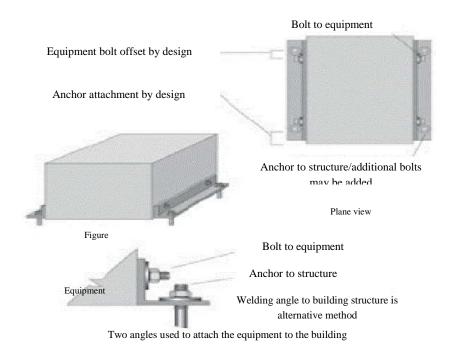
an example of improvement details of anchoring panels and kiosks
